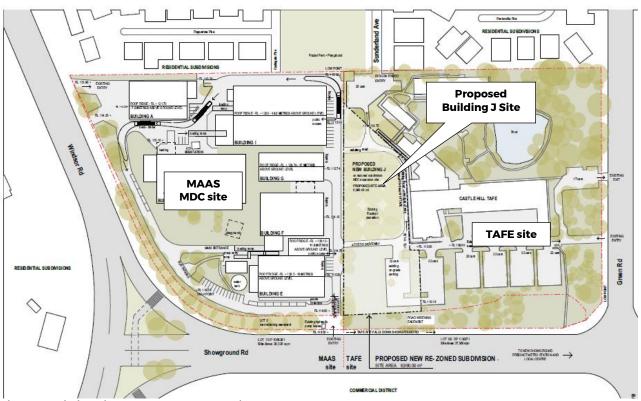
Existing Site Plan, TAFE and MDC Sites Source: Lahznimmo Architects, 2019
